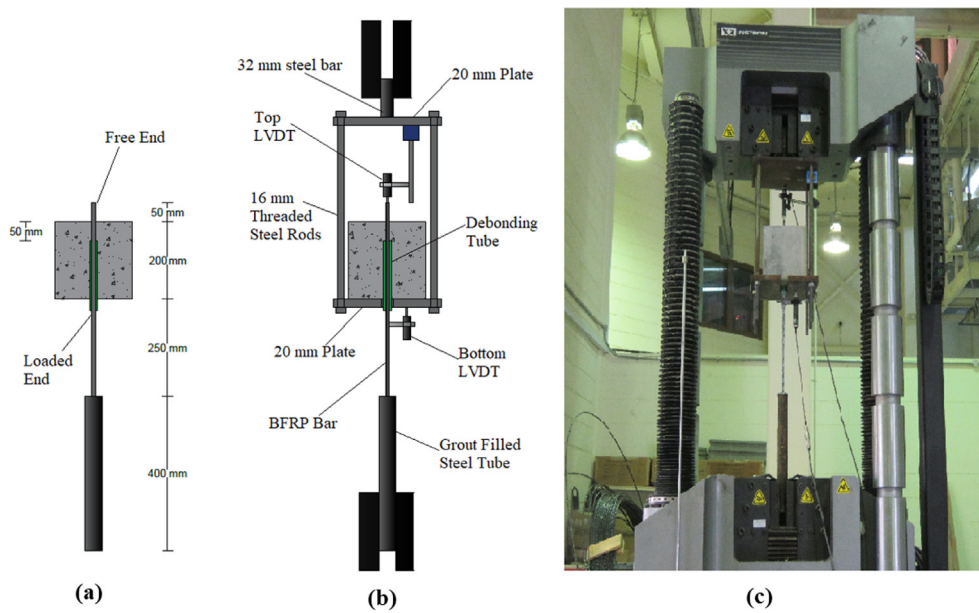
(a) Specimens Dimensions; (b) Test Setup Layout; (c) Test Setup.
